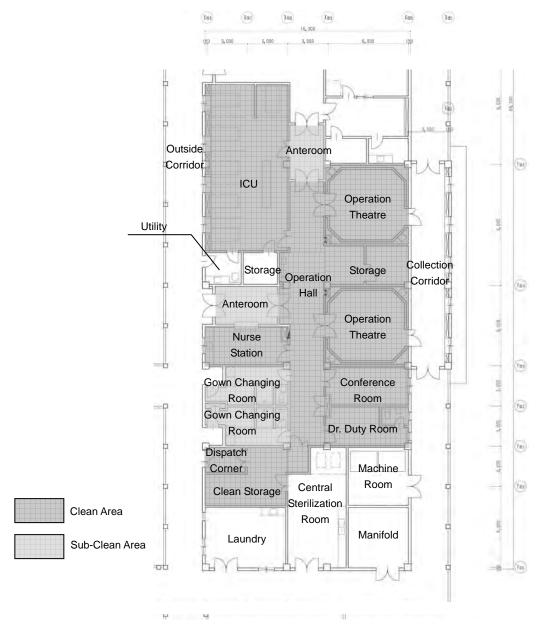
Operation & Central Sterilization Dept. Plan Scale: 1/200
